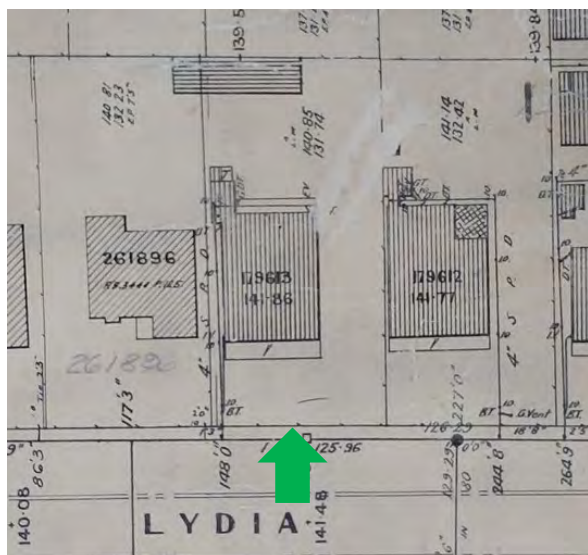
Footprint of the house and its outbuildings, 1926 (Source: MMBW Detail Plan 3217, dated 1920).
